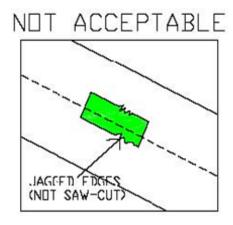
Example 4: In concrete pavements, remove sections to existing joints.
